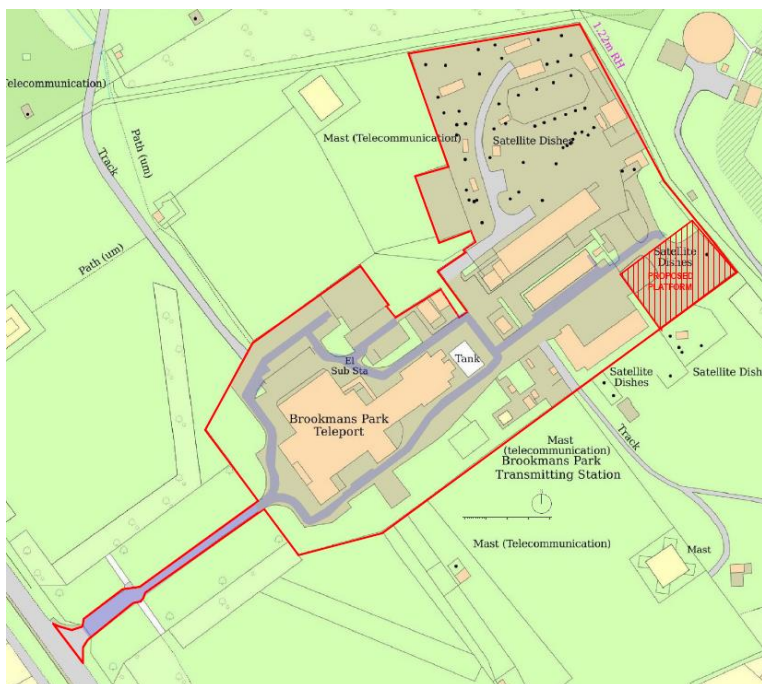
Site Location Plan. The redline covers the demise of the main Brookman's Park complex as a whole, with the area of the proposed works indicated by the red hatching.
